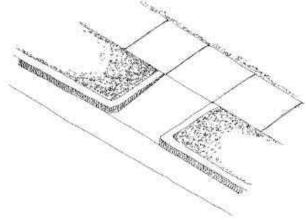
Returned curbs may be used when the curb ramp is located outside the pedestrian walkway, such as in a planting strip.
